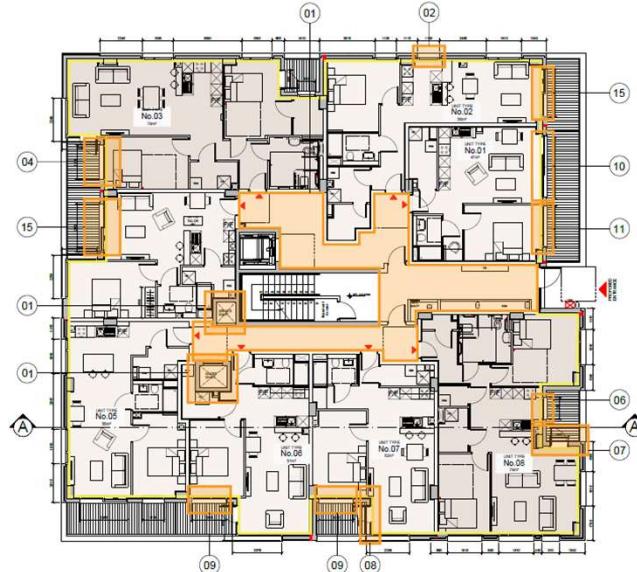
Existing Ground Floor Plan – Extracted from Existing Scheme
